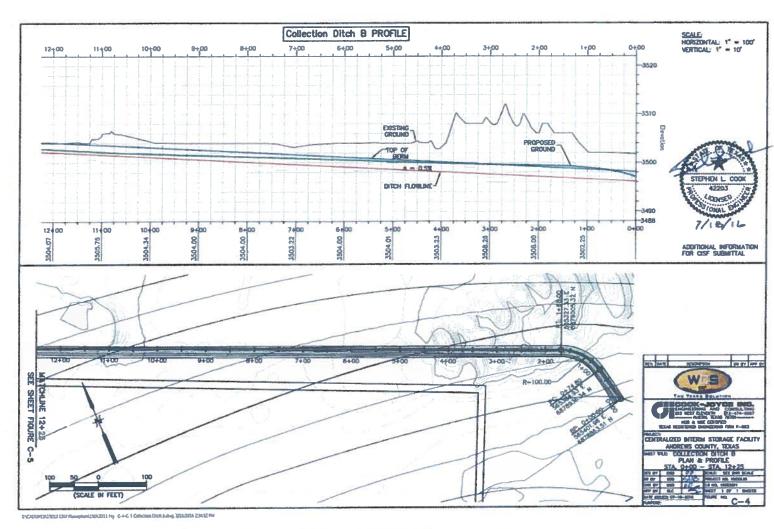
CJI C-4 Collection Ditch B Plan & Profile STA. 0+00 – STA. 12+25
